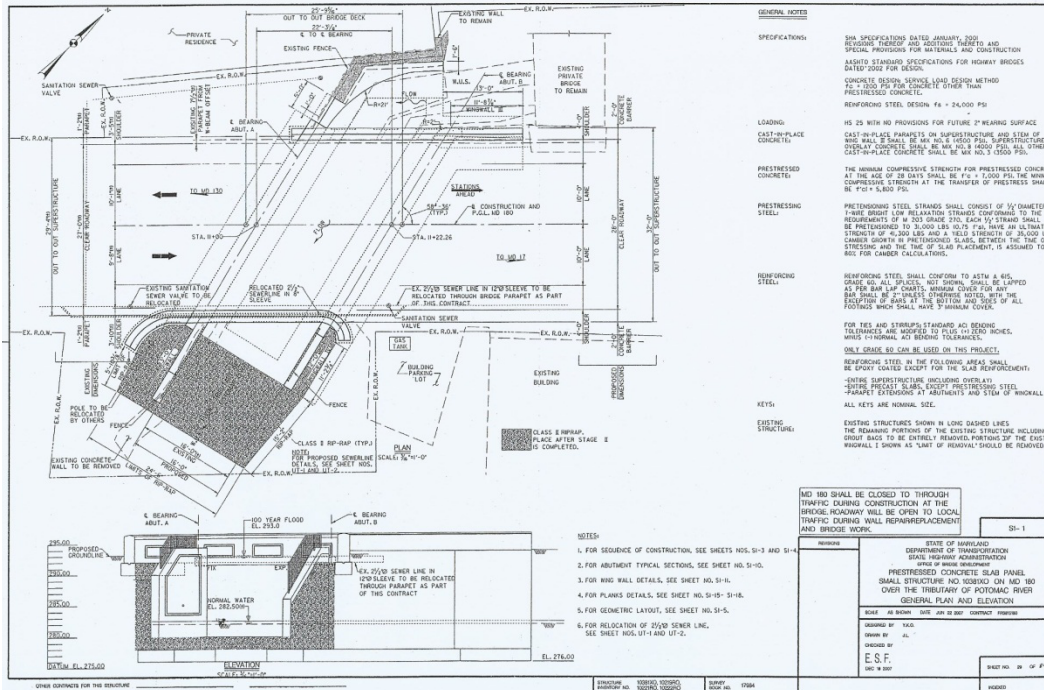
General Plan and Elevation View of the Knoxville, MD, Bridge
